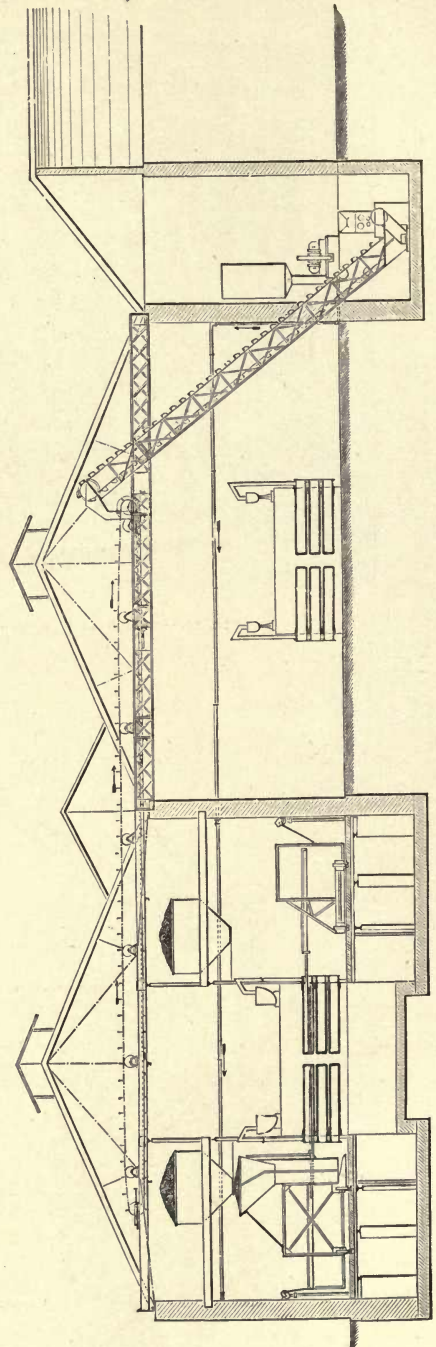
OUTLINE OF A GENERAL ARRANGEMENT OF STOKING MACHINERY.
